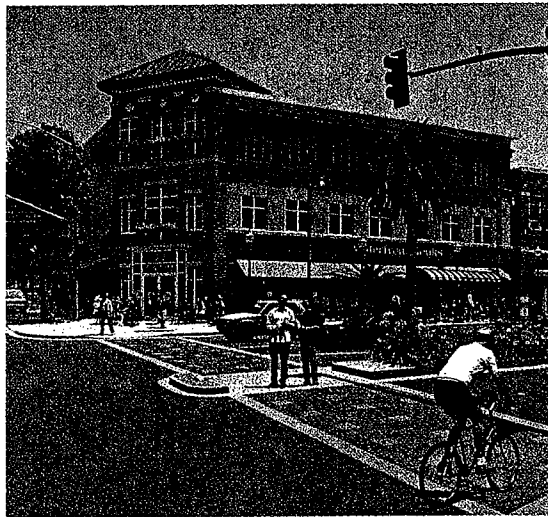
Crosswalk Design for Mare Island Way at Georgia Street
